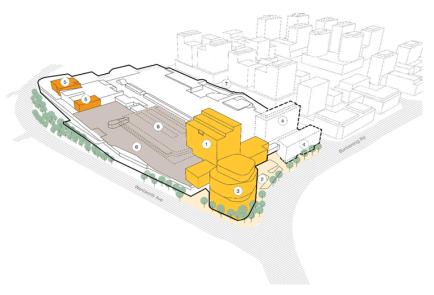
Master Plan – Key Features (including potential Future Stage tower forms)
